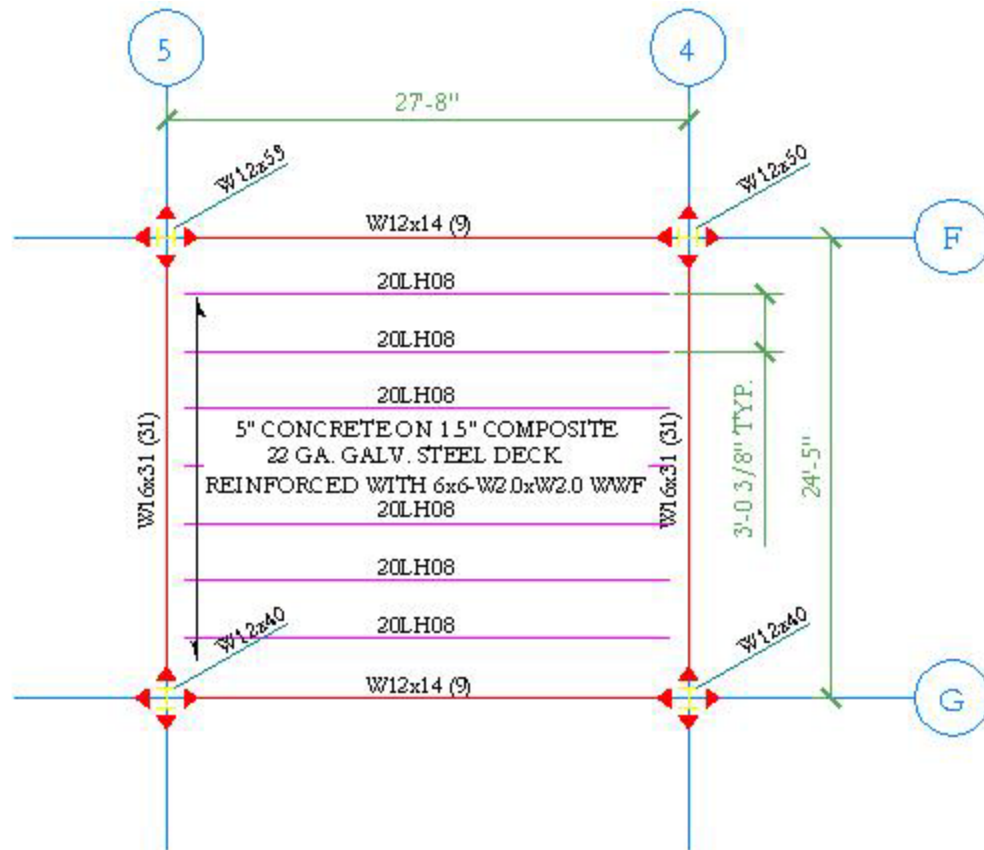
Open Web Steel Joist with Composite Metal Deck Typical Floor Framing Bay
